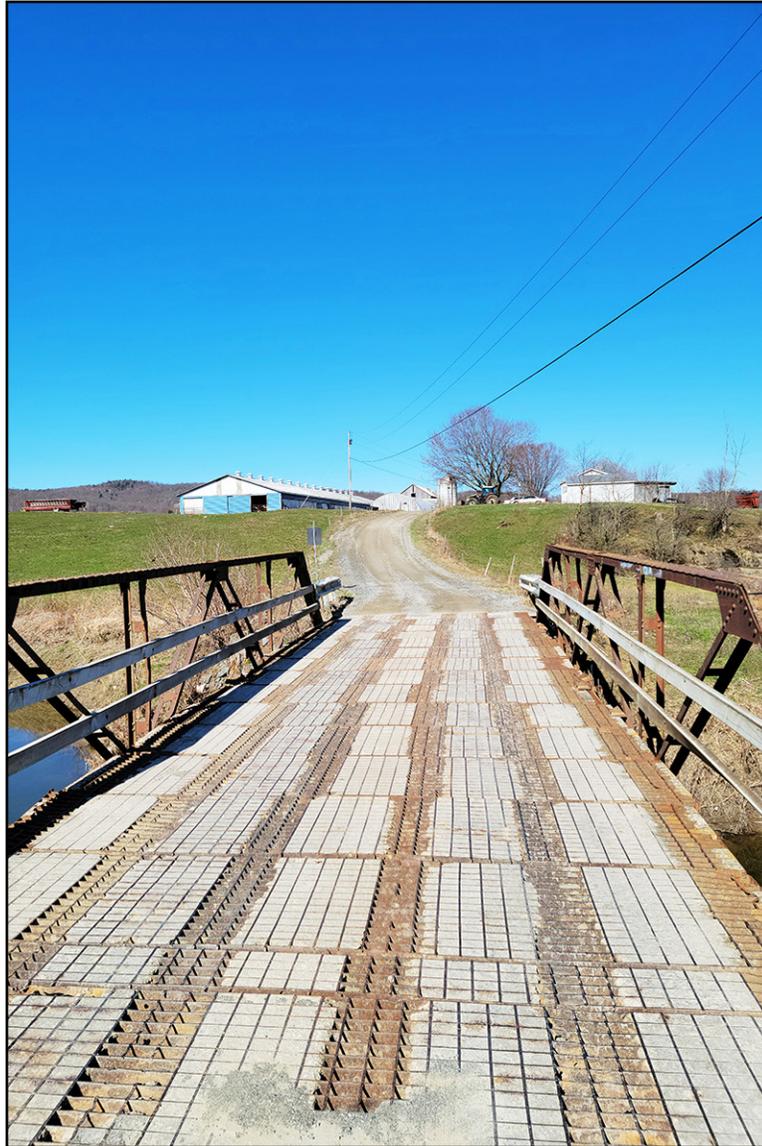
Very Gentle Grade of Road Leading up to Bridge,
